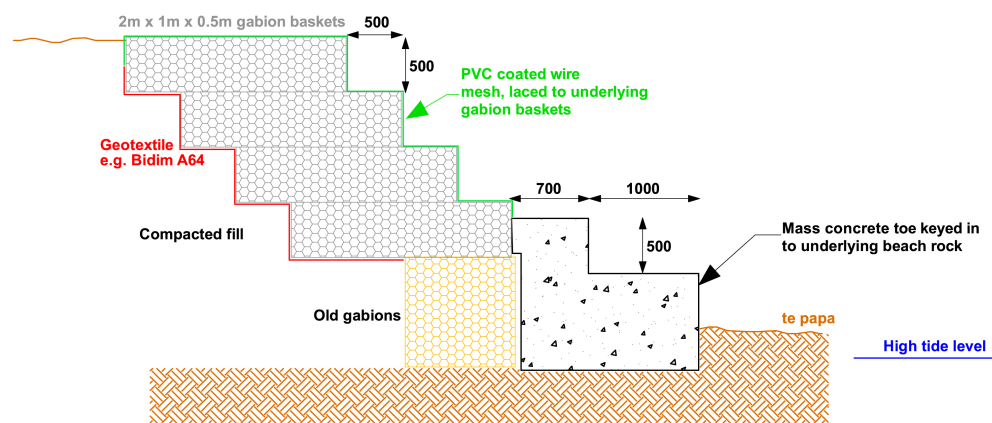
Proposed outline design cross-section along Section A of the Fale shoreline. Dimensions in mm unless stated.
